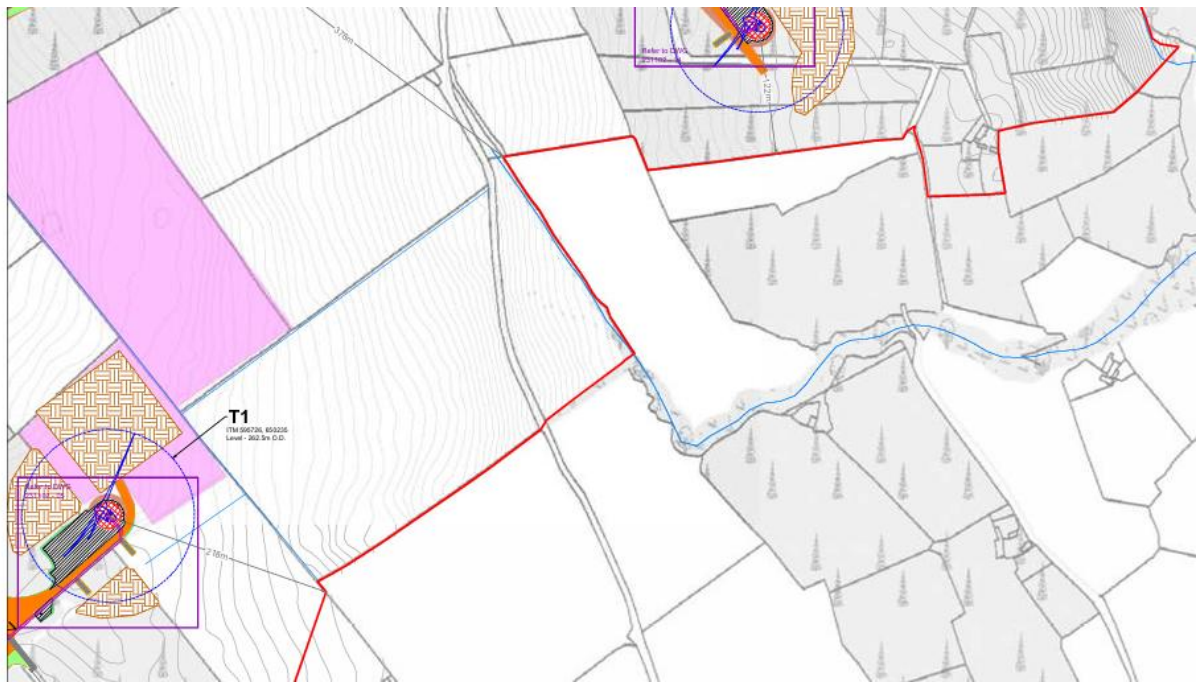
Excerpt from EIAR Appendix 4-1: Site Layout Plan Sheet 4 of 34
